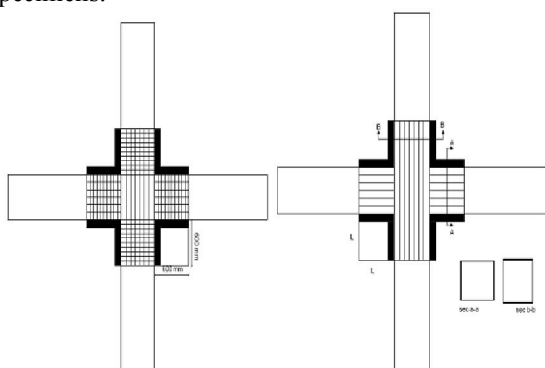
specimen of C_3 - C_5 intermediate strengthened joints before and after beam and column wrapping
